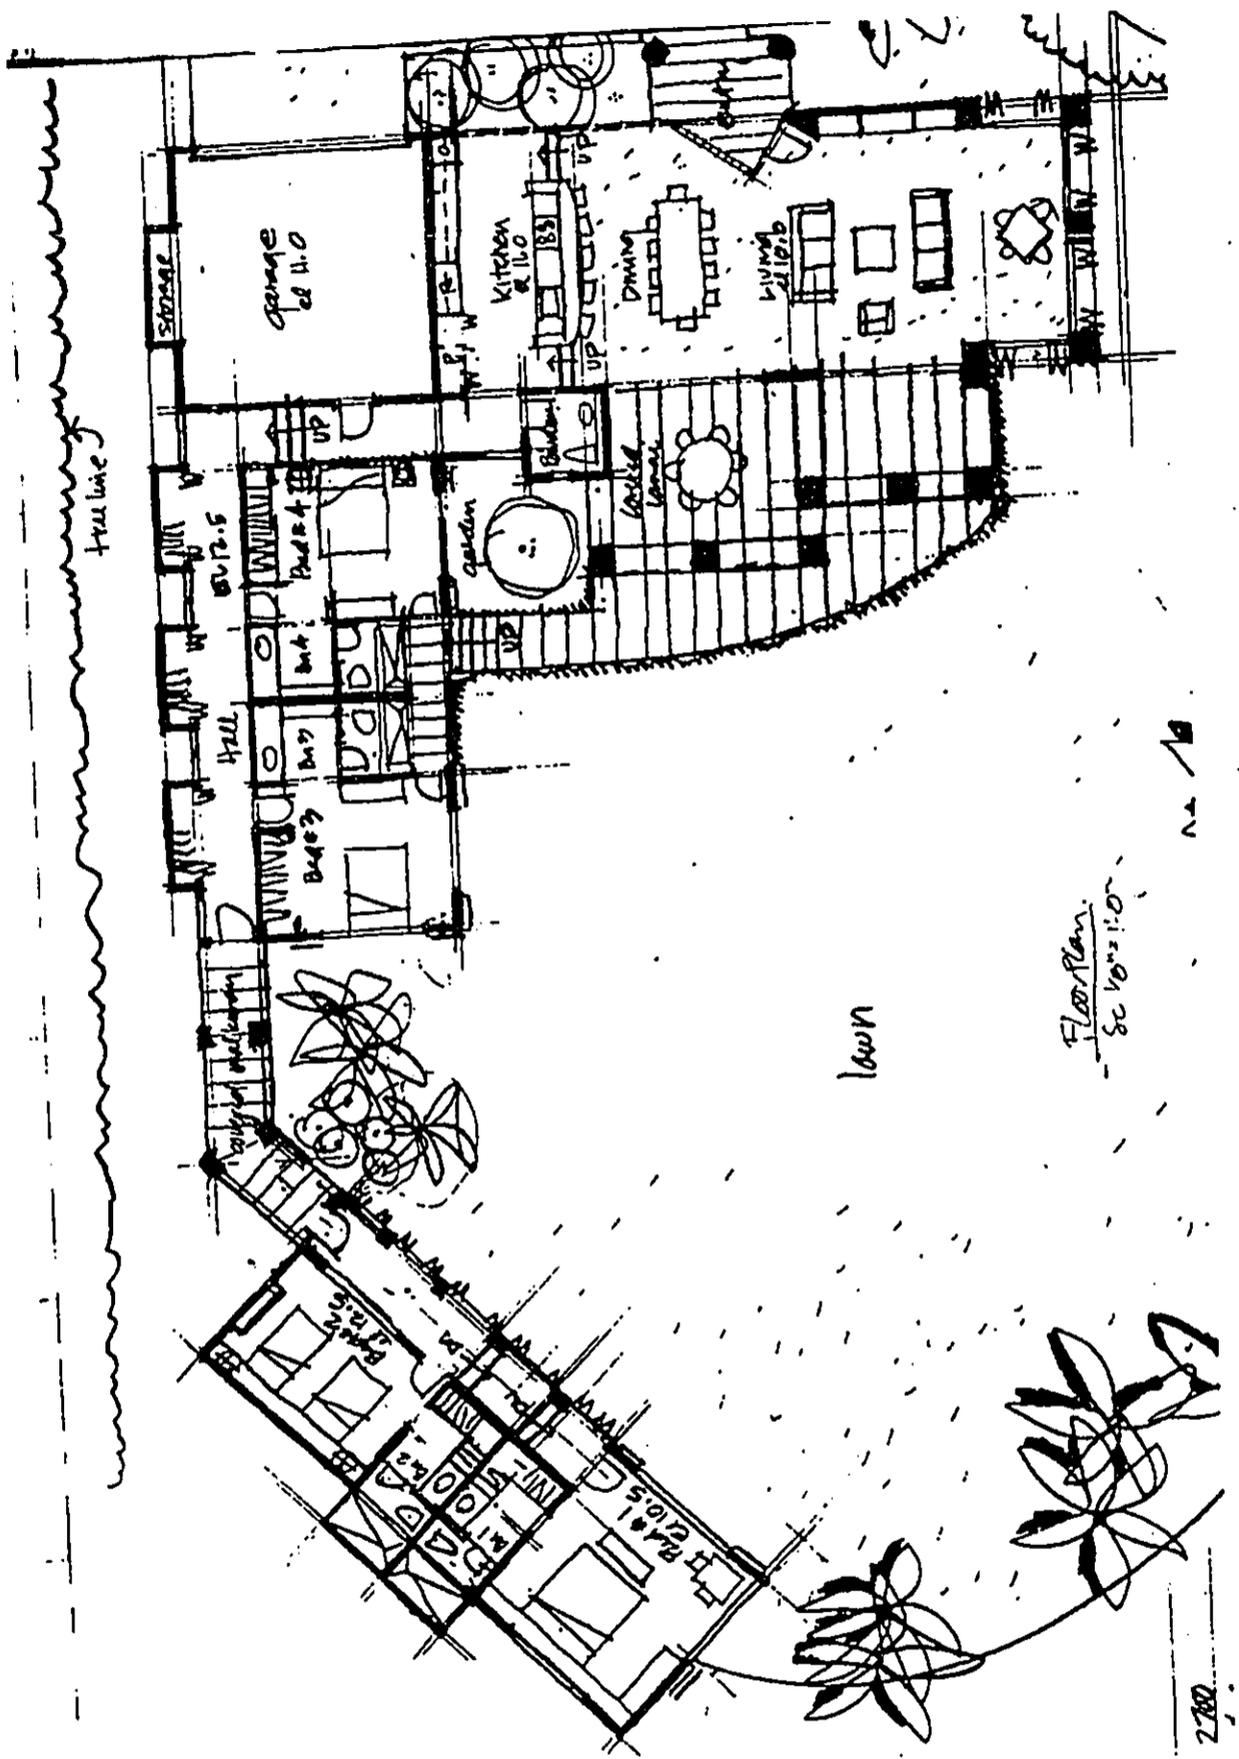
EXHIBIT "H" - Preliminary Floor Plan of residence (not to stated scale)
